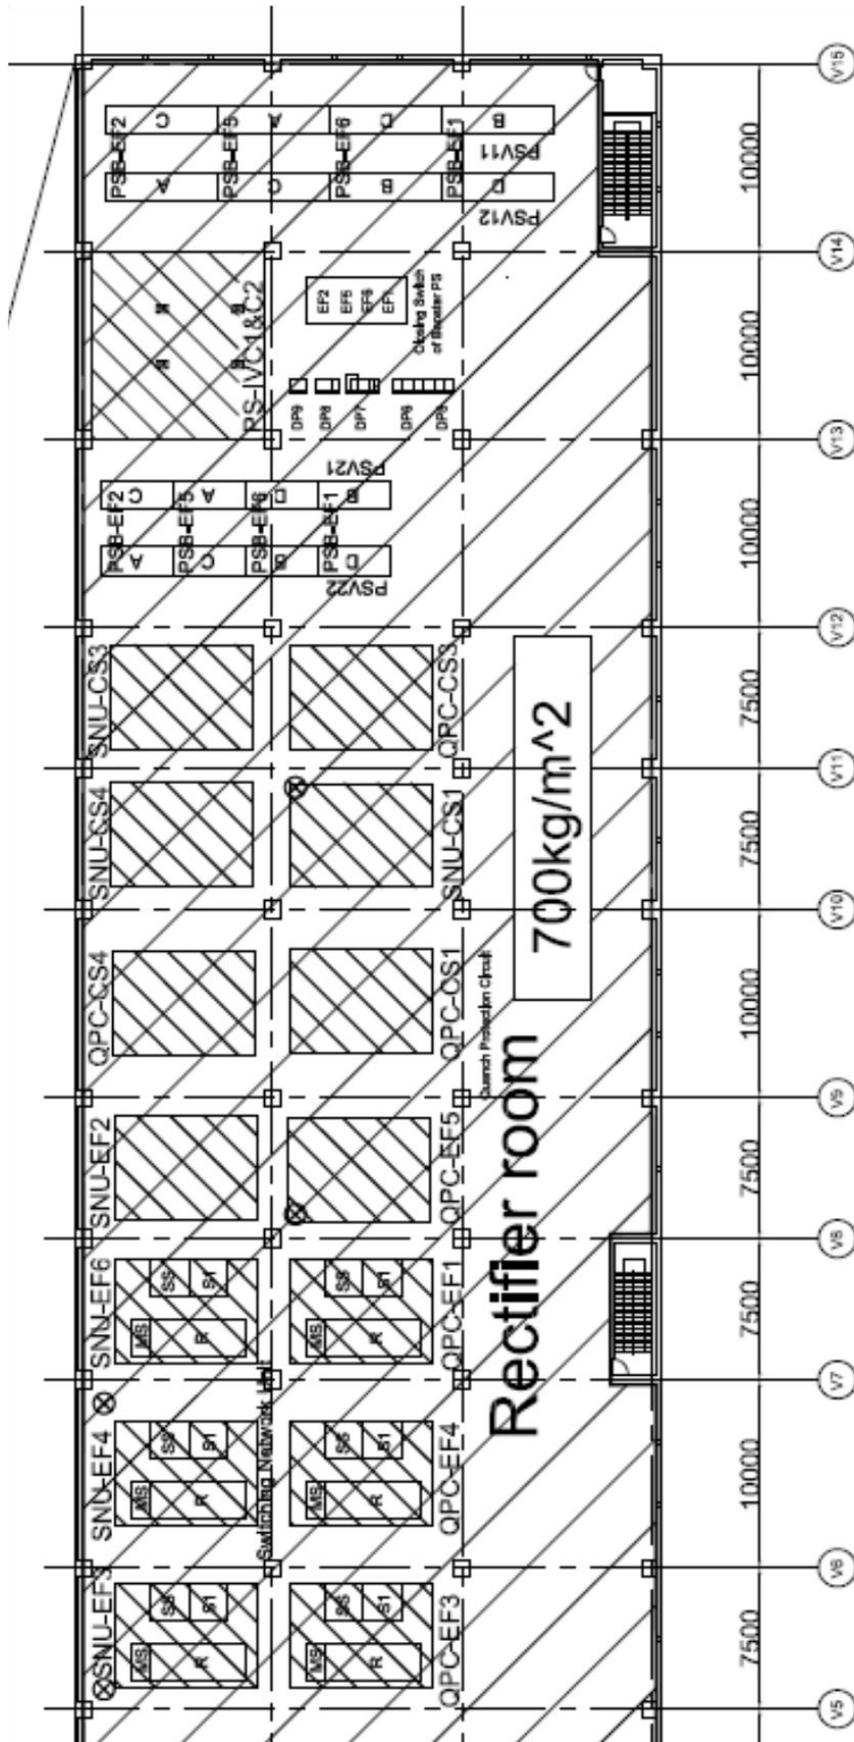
Floor load in the SNU area (second floor of the Rectifier Building).
